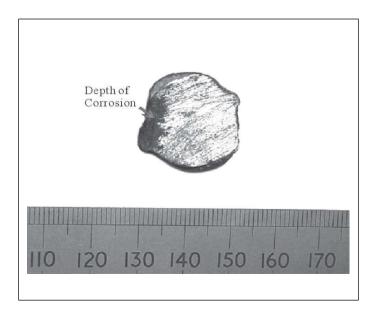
Pitting Corrosion of Steel Soil Nail
